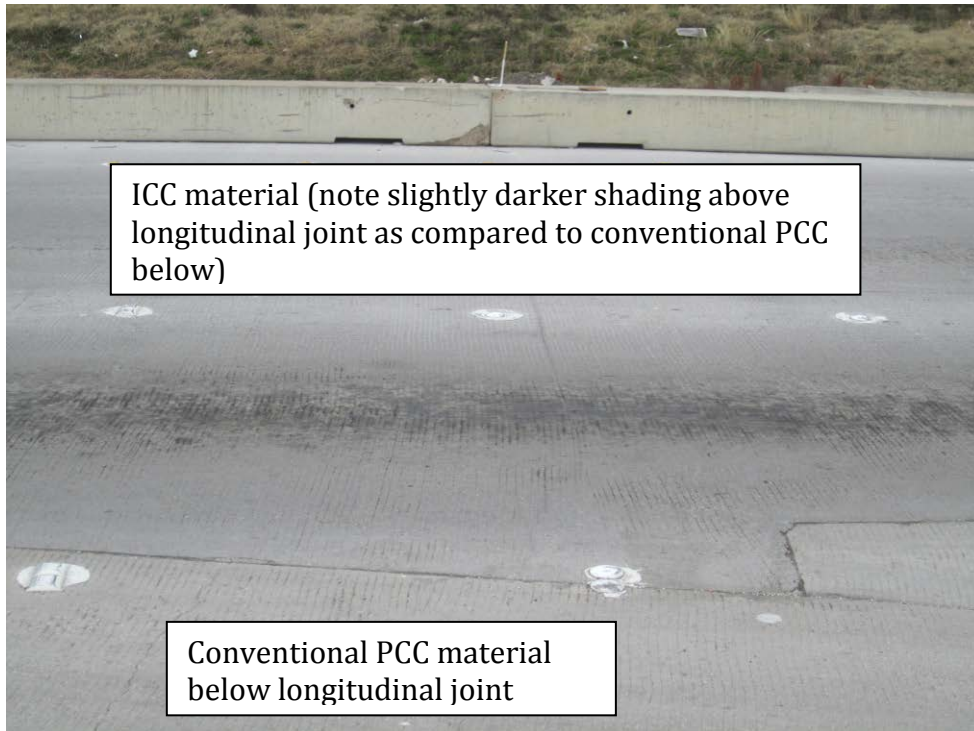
Photo of short section of I-635 off ramp that was constructed with ICC.
